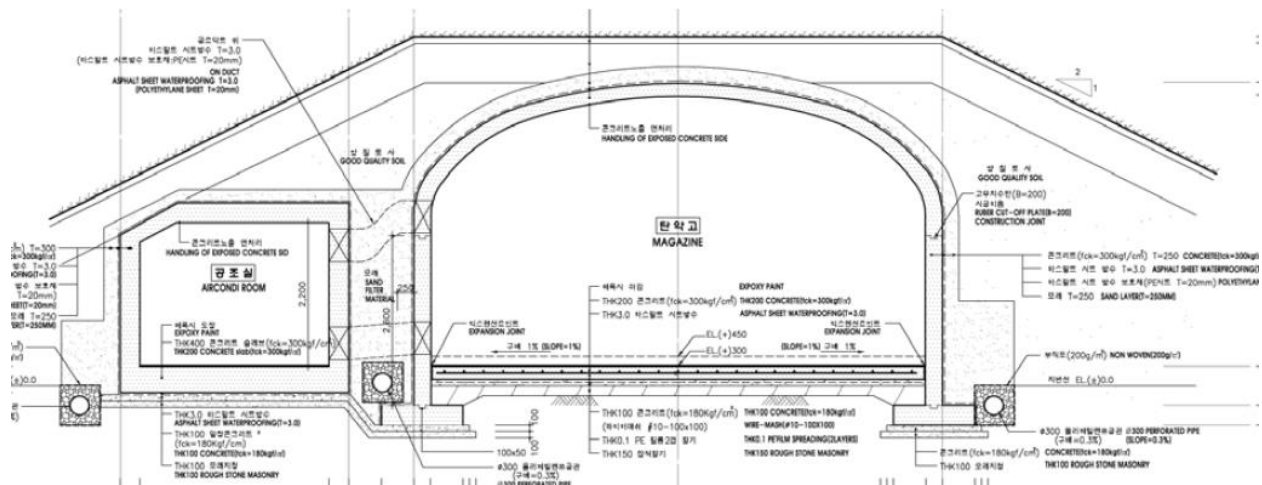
Cross-section of Korean 33-15-74 with HVAC room option
